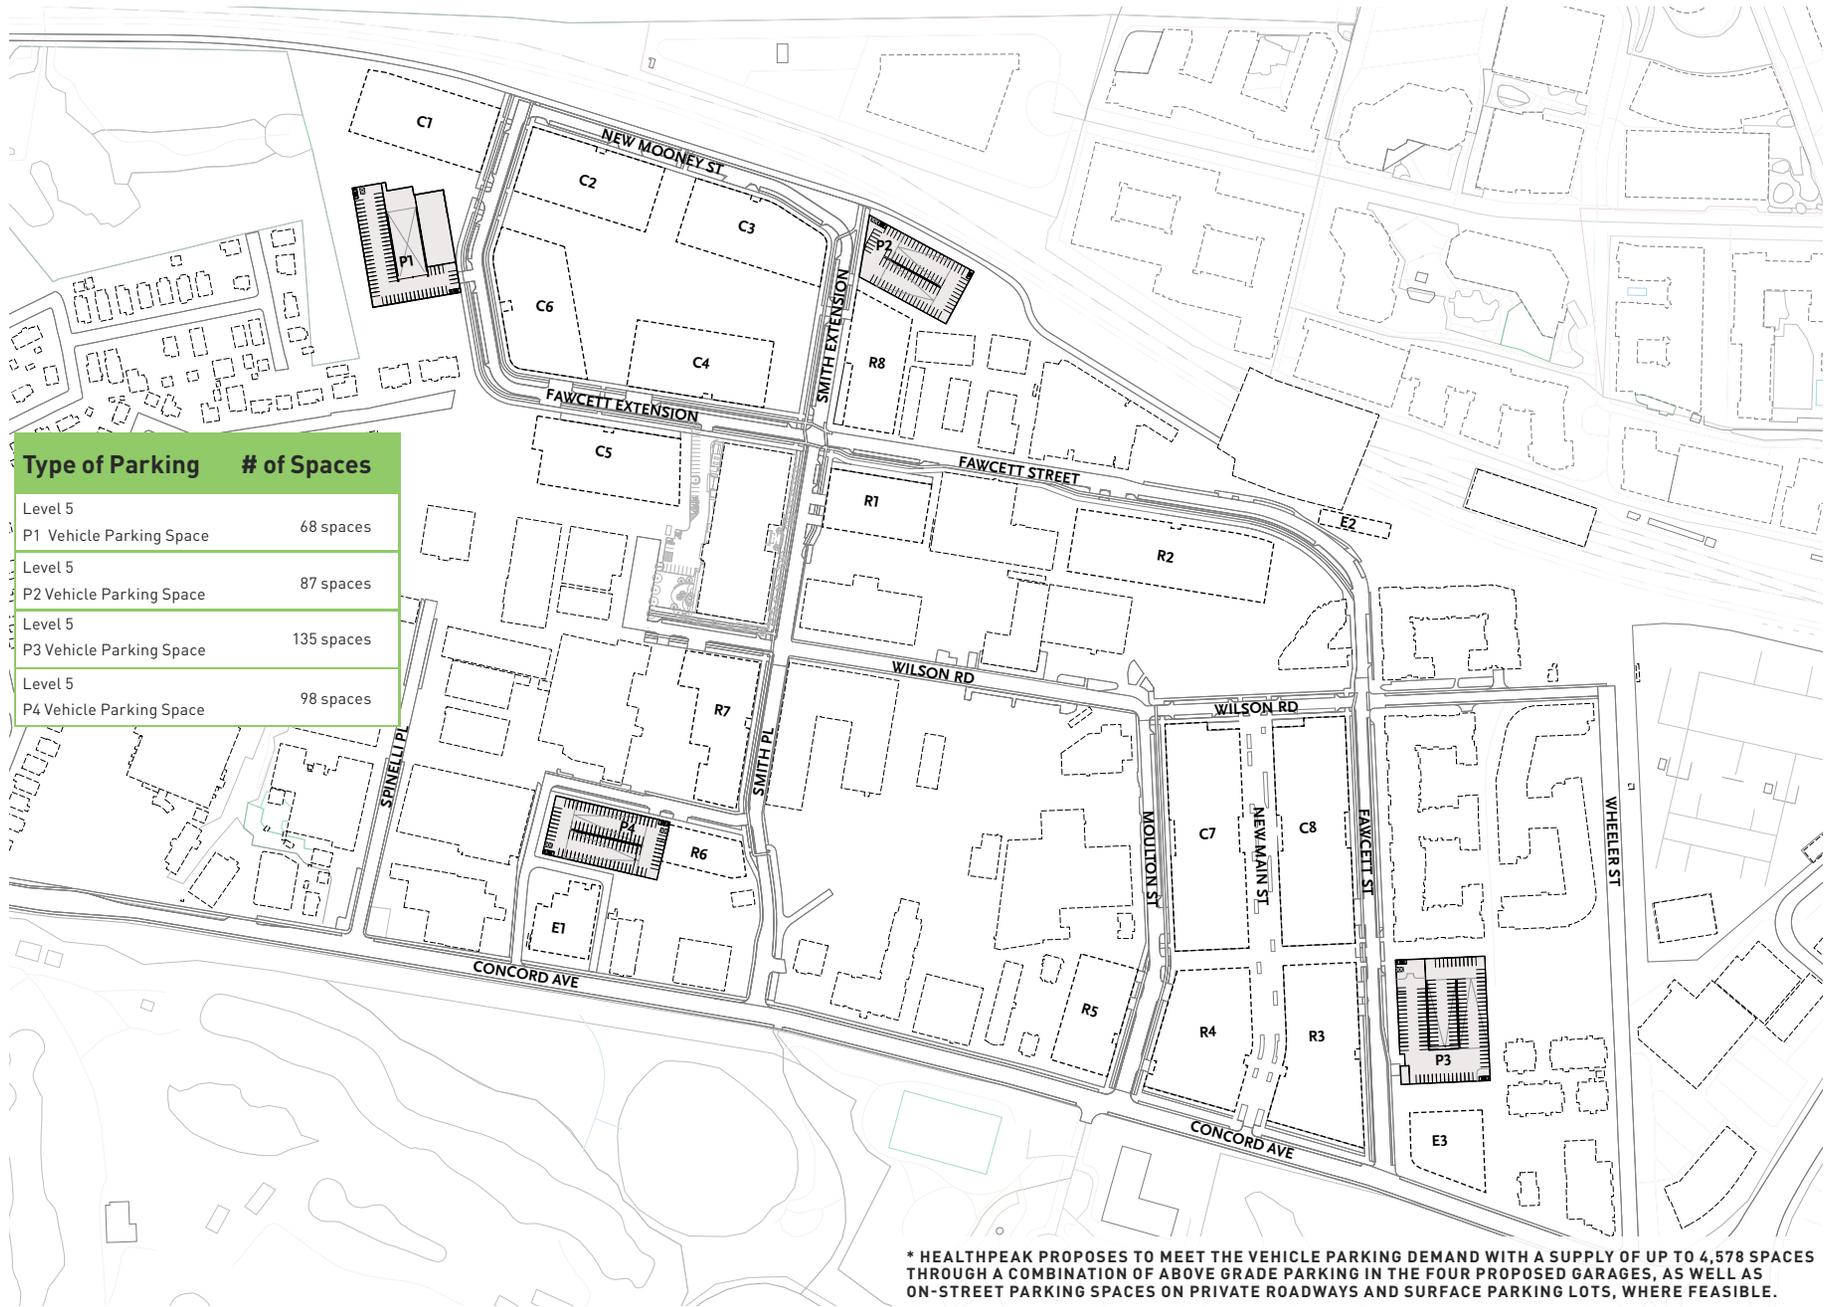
C.7: Parking Facilities - Level 4 Plan
